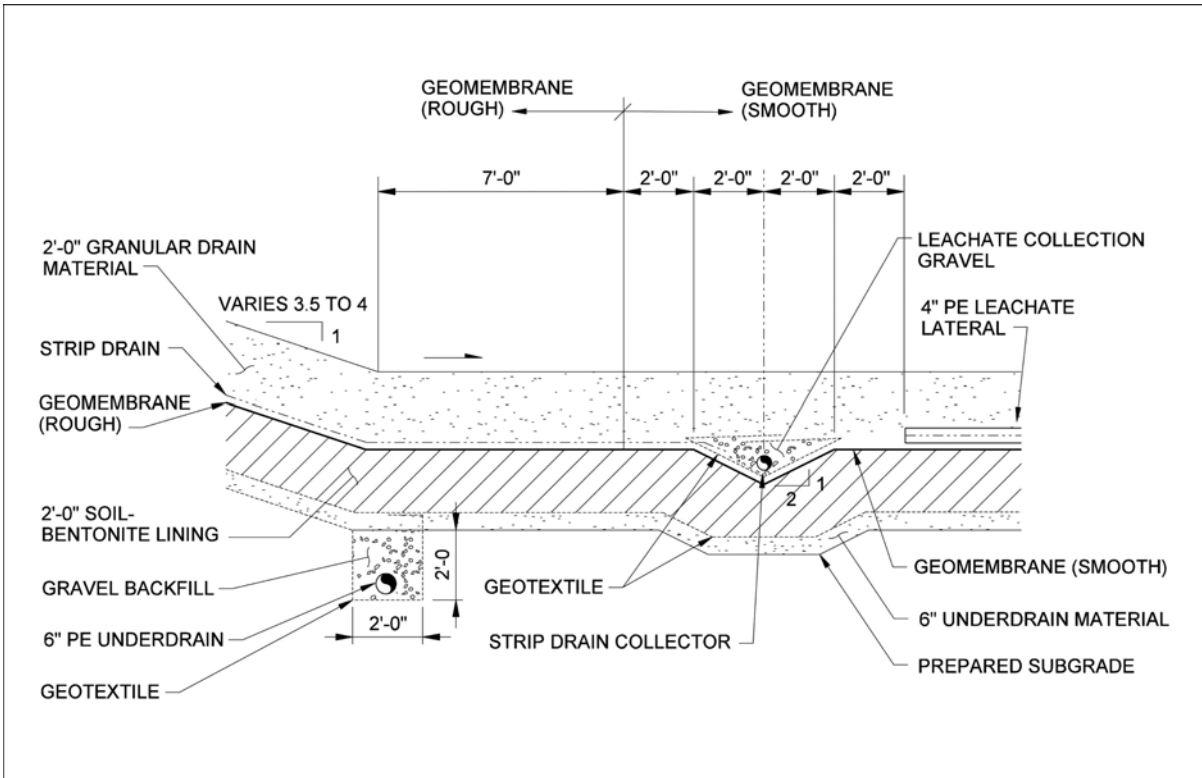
Leachate and Underdrain Collection System – Toe of West Slope
